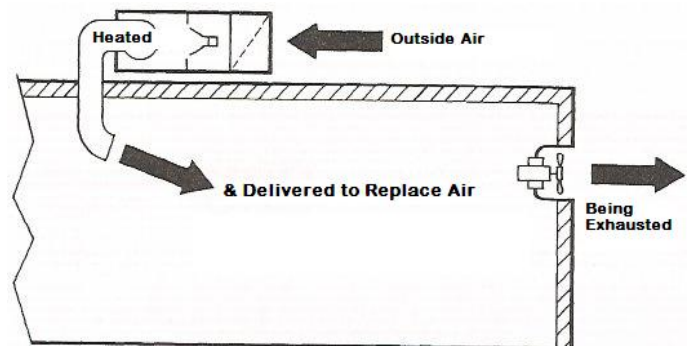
Typical Application – For Every Cubic Foot of Exhaust Air – a Cubic Foot of Make-UP Air is Required.
